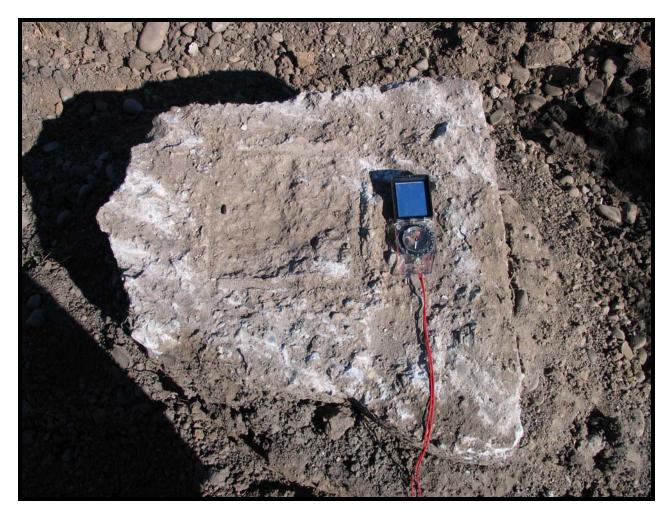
Hand-dug wooden guide-mold footing at Browning USARC and LTA (Installation UT-007/035).
